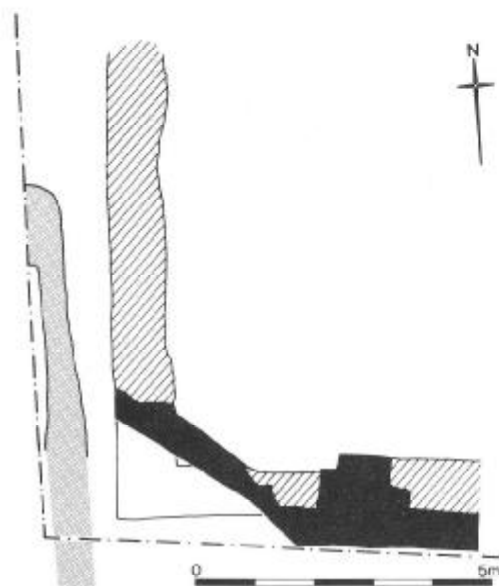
detail plan of Building A, south-west corner, showing early 2nd century developments. Retained wall hatched, robbed corner in outline, new walls black.
